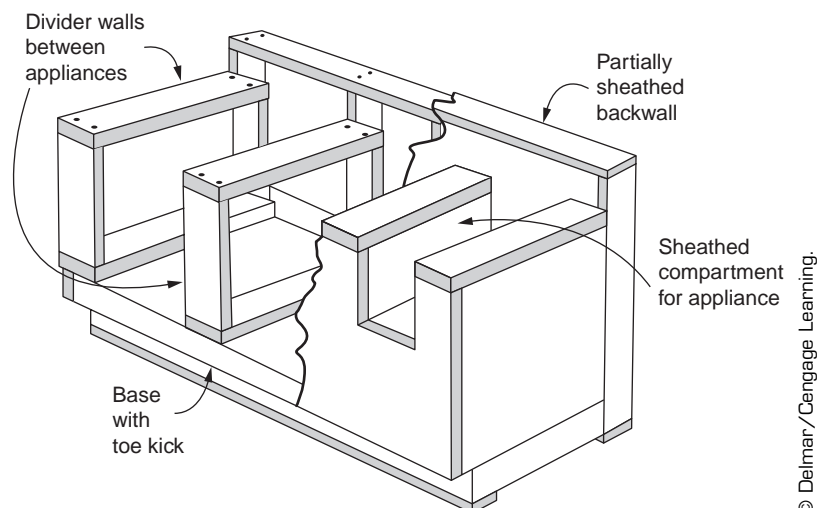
Framing the backwall and base for an outdoor kitchen.
